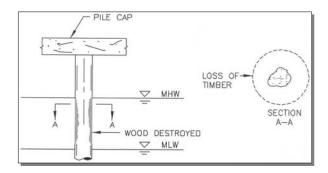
Typical Abrasion Damage to Timber Piles
